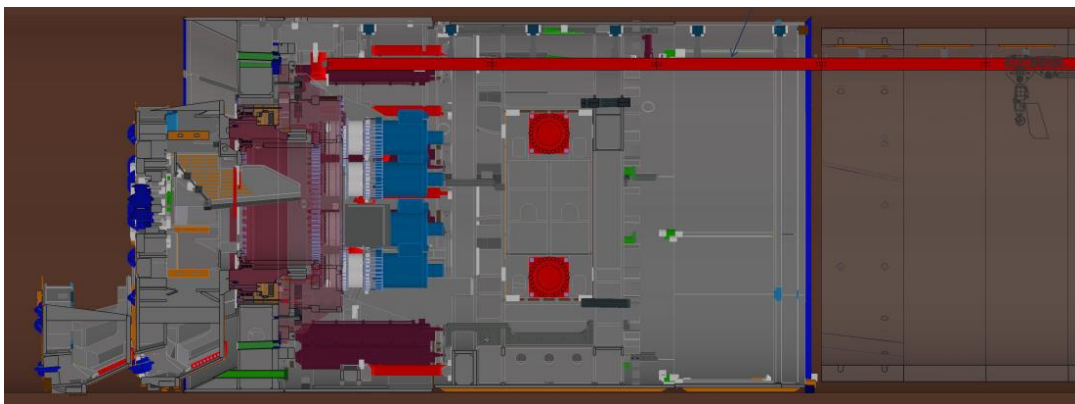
Lengthen of the crane runway ("HK 5102-091-001-01 Shield Disassembly", Herrenknecht, 2022)
